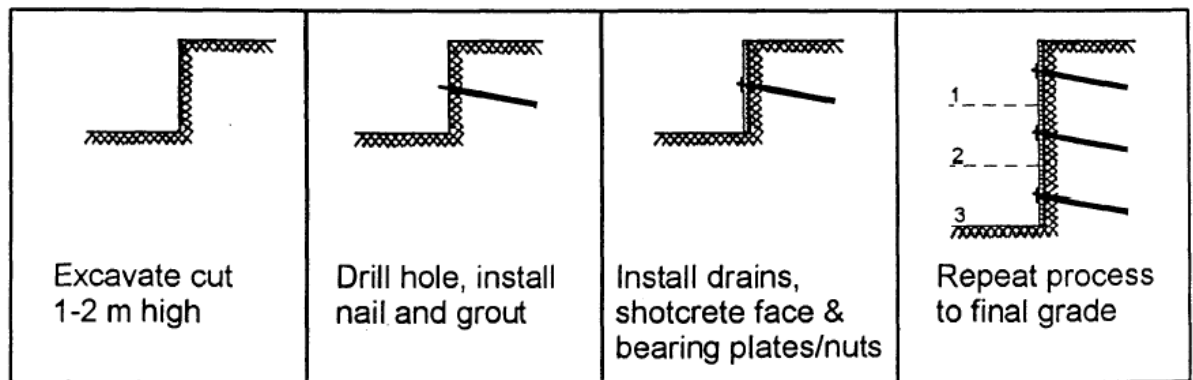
Soil nailing for excavation support (after Walkinshaw and Chassie, 1994).
